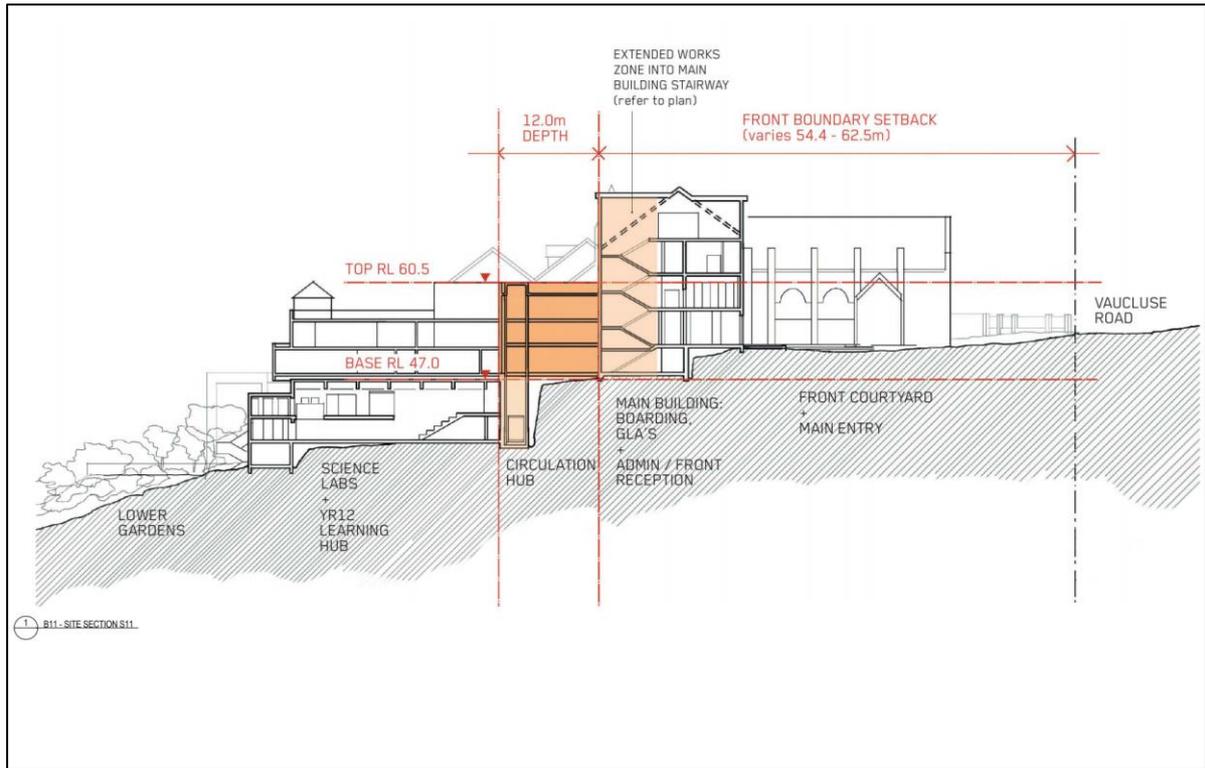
| Precinct B concept circulation hub (Source: Applicant's RtS 2021)
